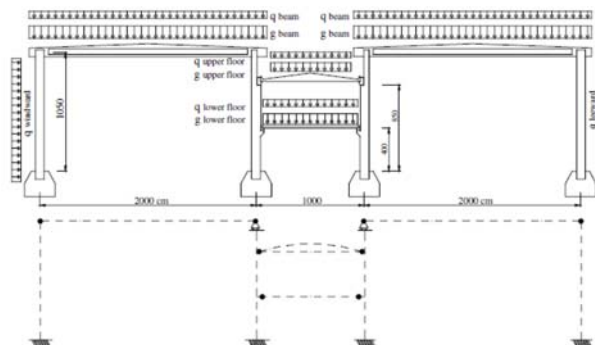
Three-span prestressed concrete frame, static model and acting loading system.
